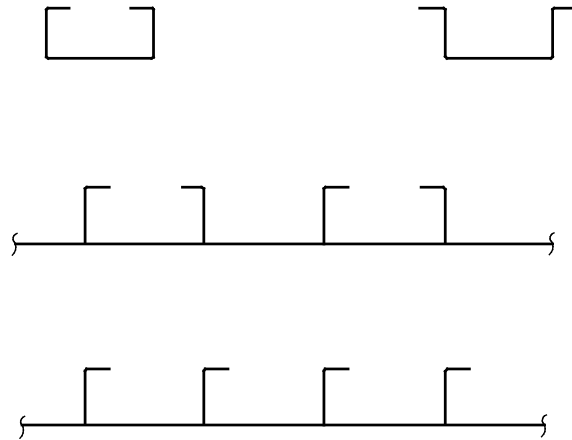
Combined Sheet-Stiffener Sections
